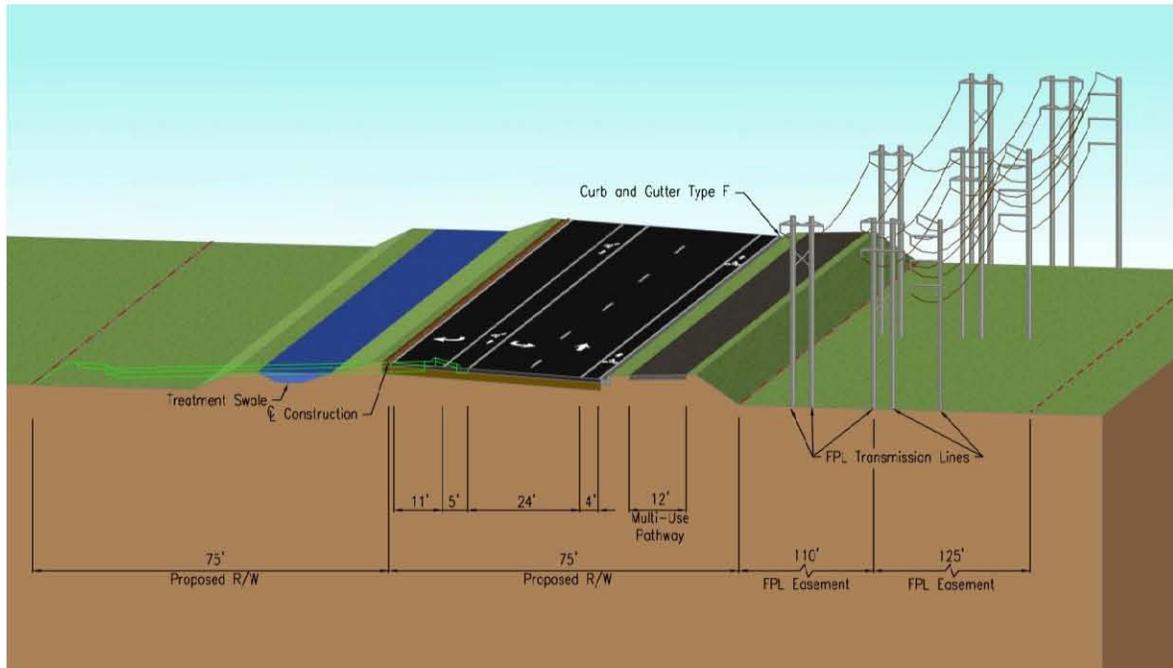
Preferred Typical Section – Center Alignment Section 1
